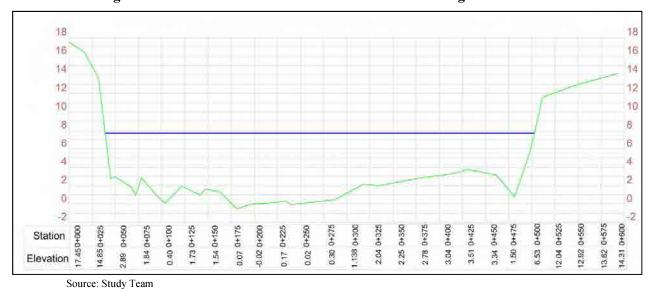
River Cross Section of the Alternative Bridge Locations B-3
